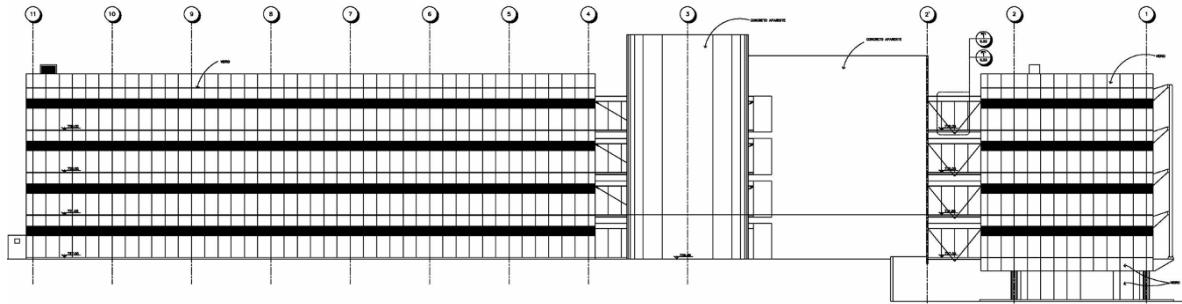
Elevation of North Façades, with Horizontal Brise-Soleil (black stripes) and Vertical-Brise Soleil (thin vertical lines)
